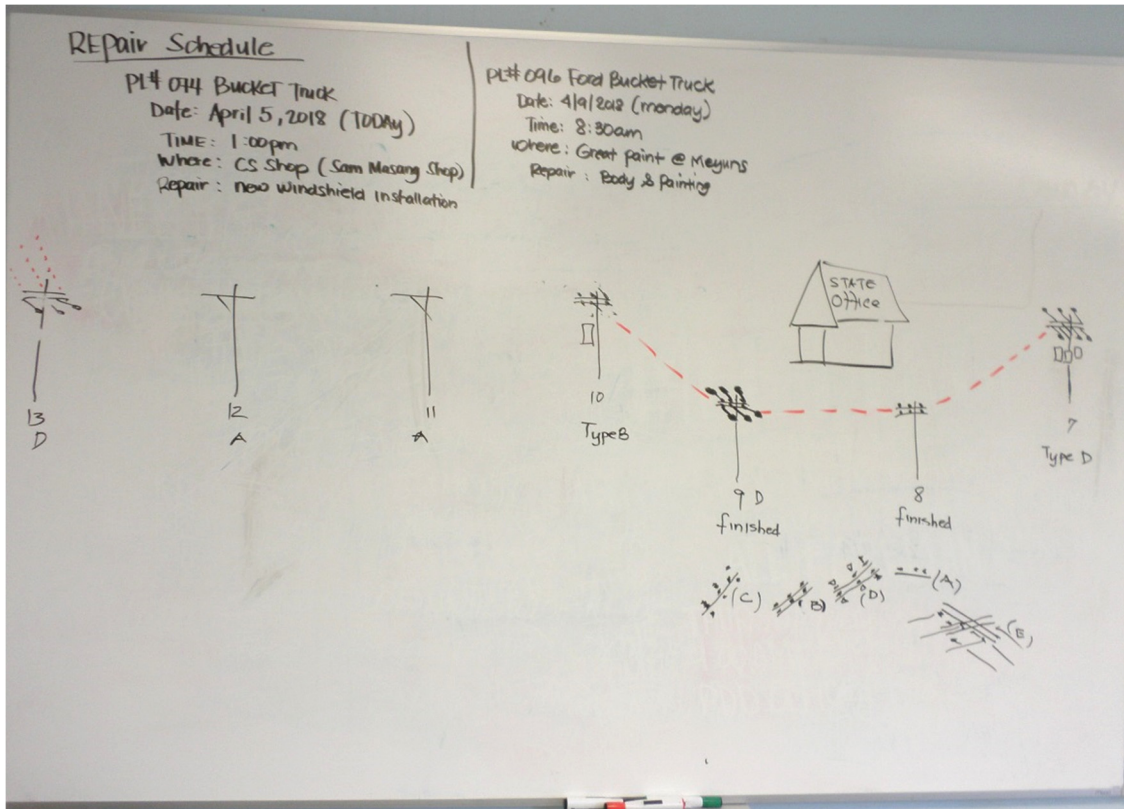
Design drawing used for repair work (shown at a pre-construction meeting)
